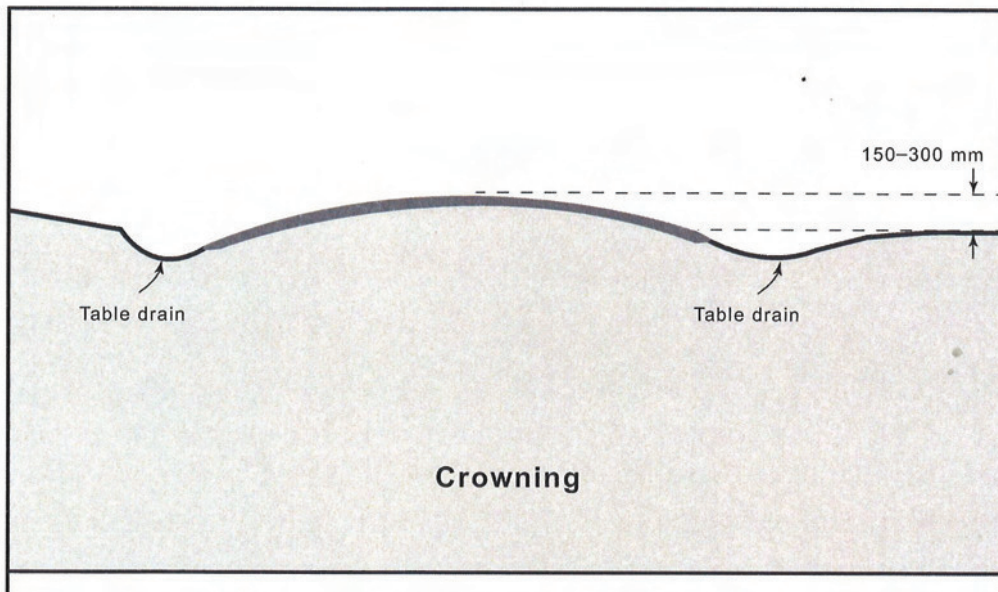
Typical crowning of the track surface on ridge top tracks (Source: Managing Urban Stormwater; Soils and Construction – Volume 2C Unsealed Roads).
